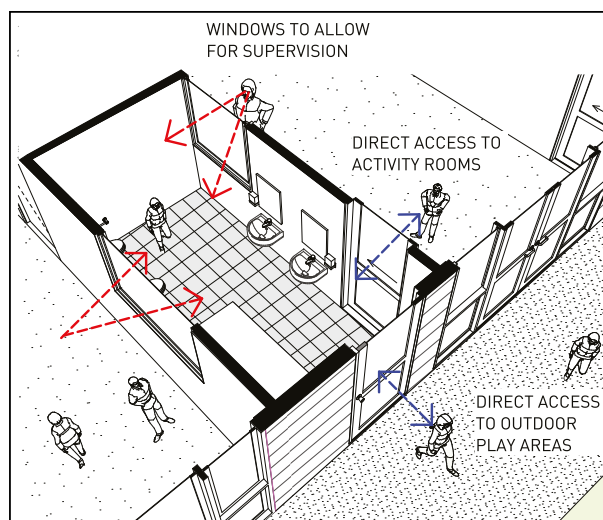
Bathroom facilities to have direct access to outdoor areas and activity rooms. Supervision requirements need to be considered in the design to prevent blind spots.
